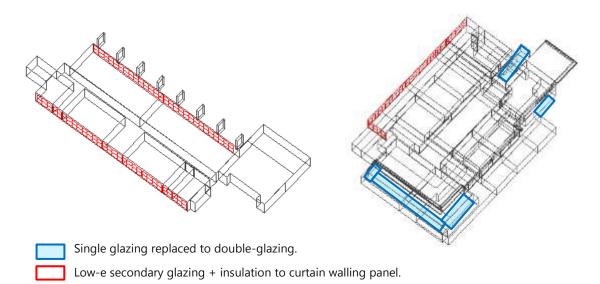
Building fabric mark-up for Phase 1 (note that roof insulation and internal wall insulation also currently under review)
